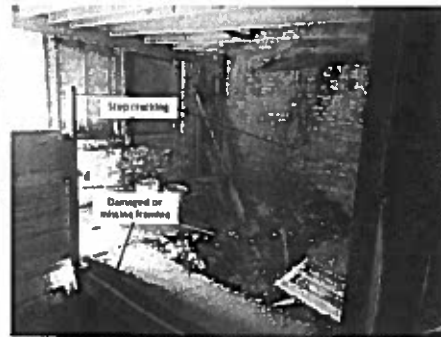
Step cracking on left side wall and damaged or missing first floor framing
